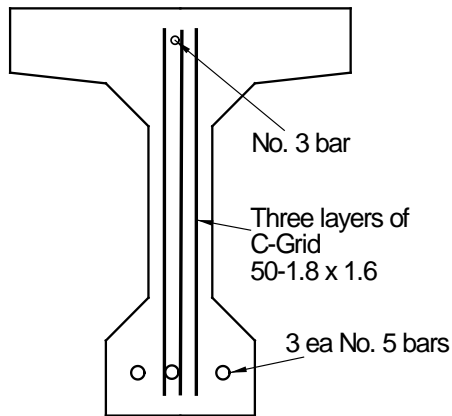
Cross-Section of Specimen 2 with Typical C-Grid Reinforcement
